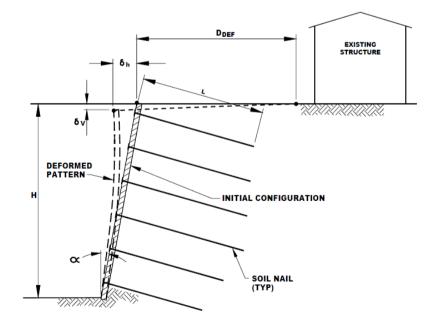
Deformation of the Soil Nail Wall (modified after Byrne et al., 1996)
